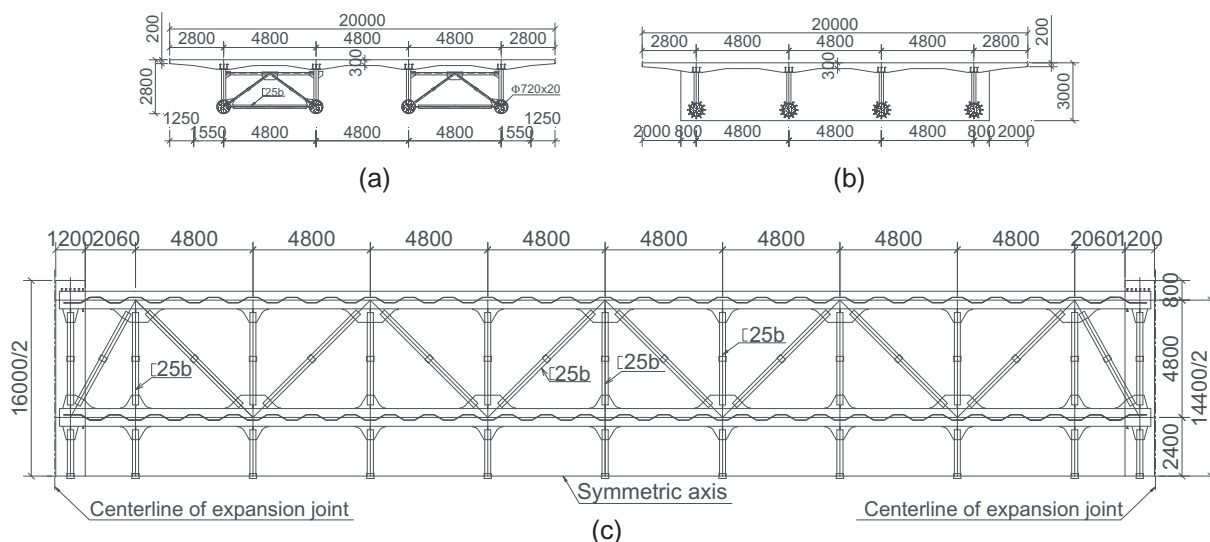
Design of the left sub-bridge of the Maluanshan Park Viaduct (Unit: mm): (a) cross-section at the mid-span; (b) cross-section at a support; (c) arrangement of bottom truss structure.
